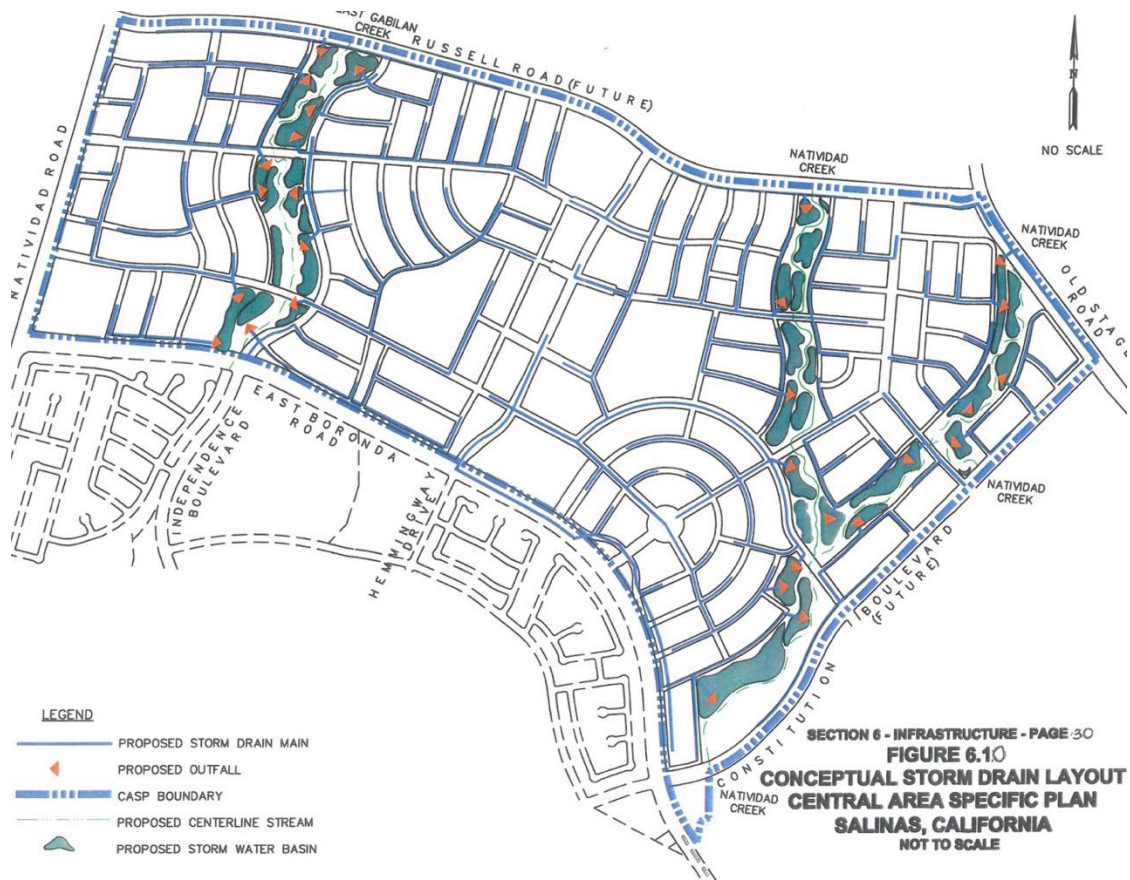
CASP conceptual storm drain and stormwater basin plan. Source: CASP Draft, 2013.
